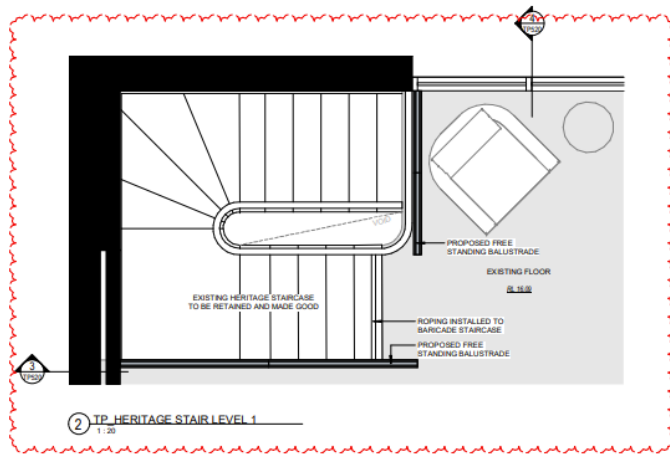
Plan of the new code-compliant, freestanding balustrades enclosing the timber staircase. Source: Embrace Architects, 2026.
